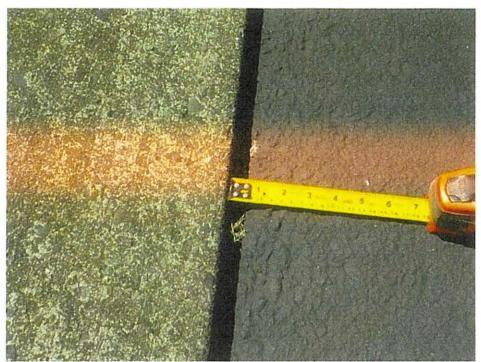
View of an approximately ¾ inch gap between the edge of the asphalt surface and curb along the southern side of Sahhali Drive north of the site (2018).
